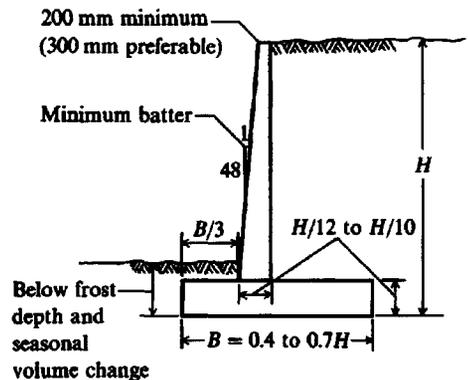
Tentative design dimensions for a cantilever retaining wall. Batter shown is optional.
